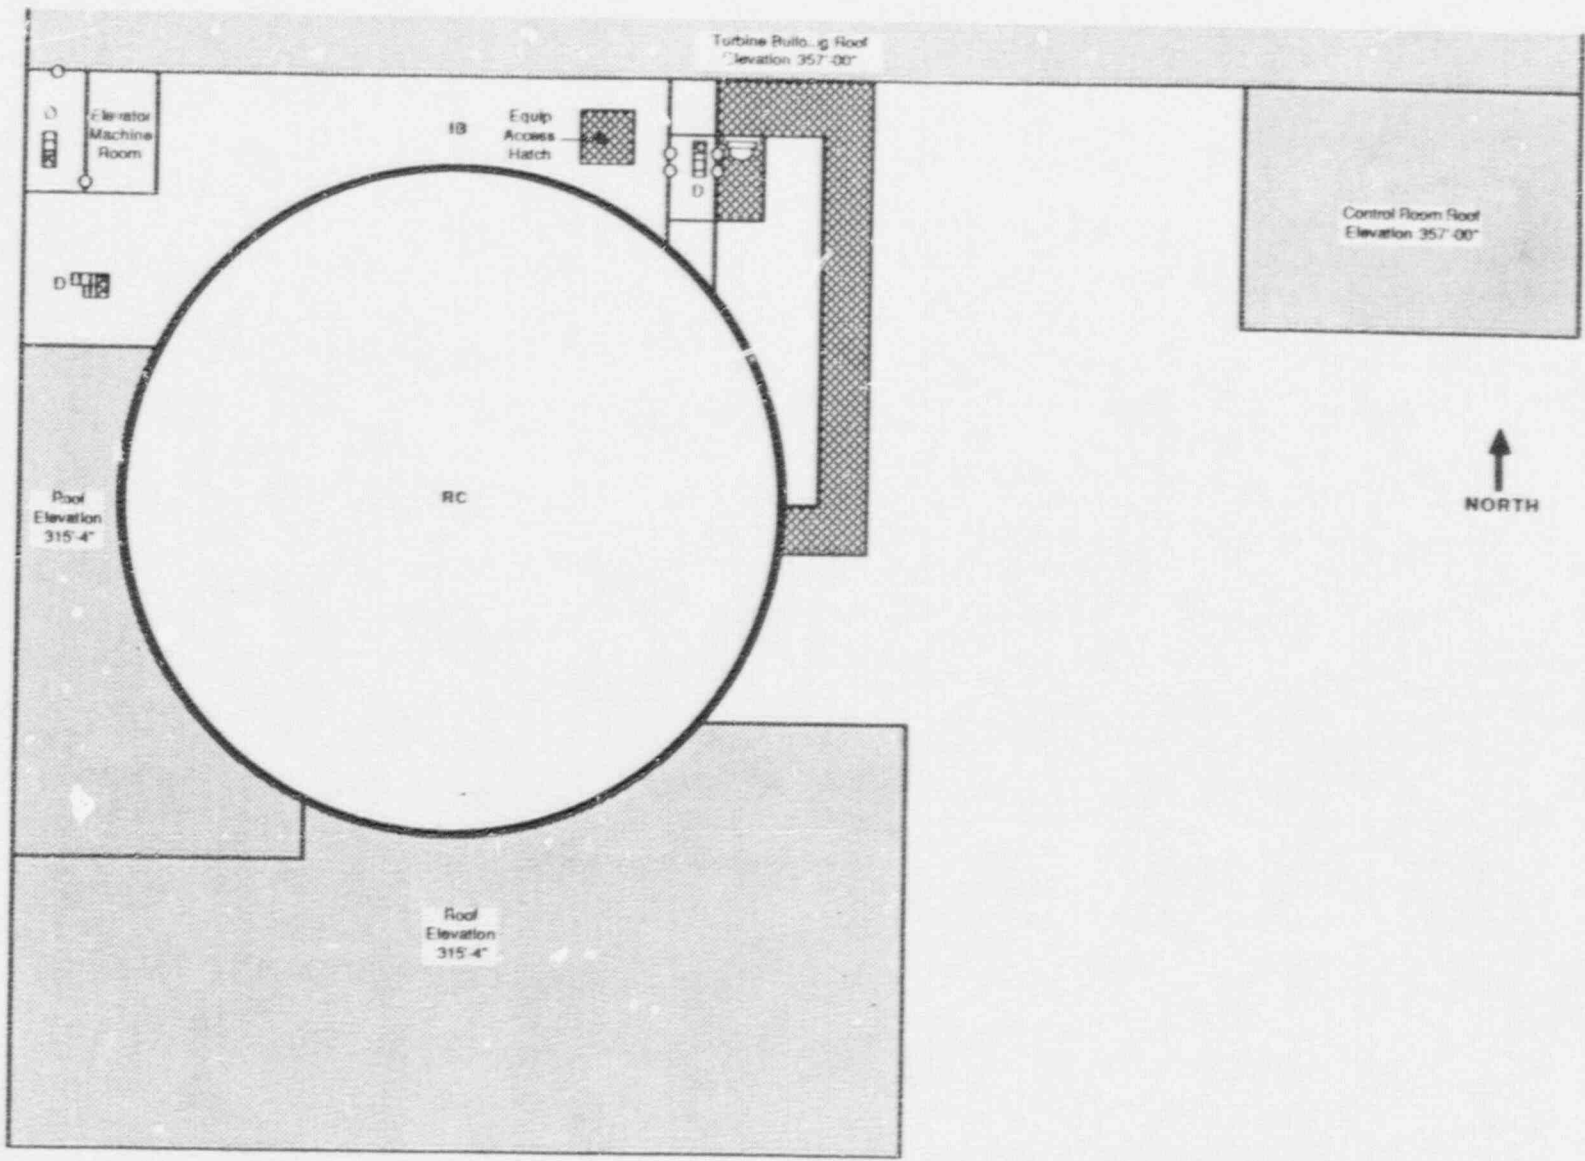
Ginna Reactor Building, Elevation 293'-0"
